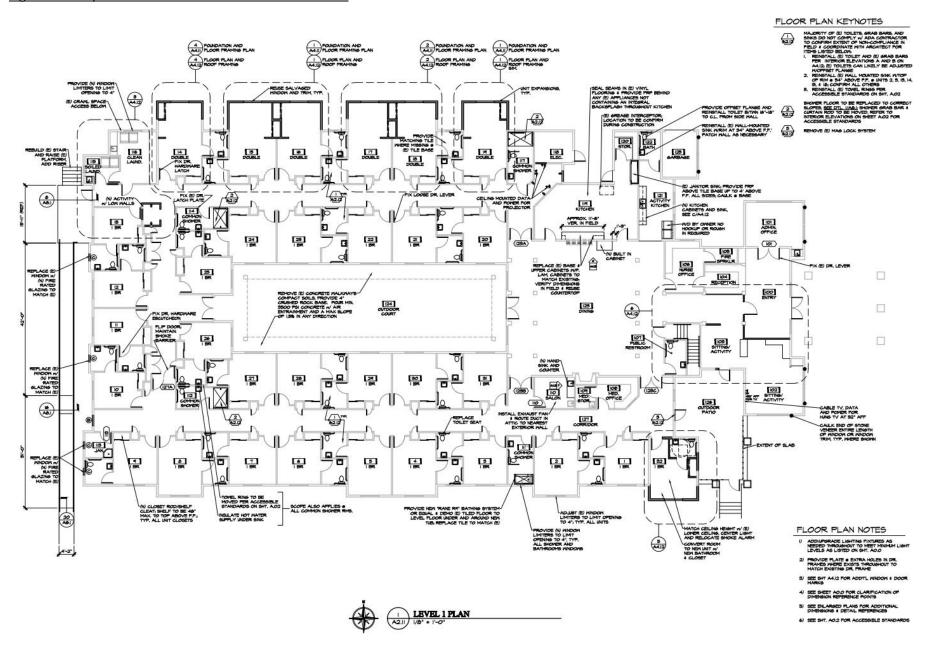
Proposed Floor Plan – Demolition – Not to Scale
